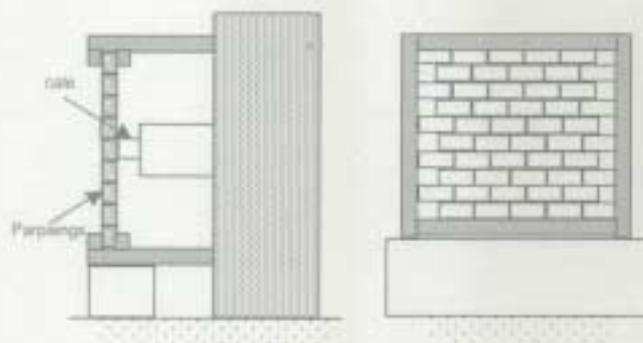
Testing-bench for out of plan masonry wall behaviour
